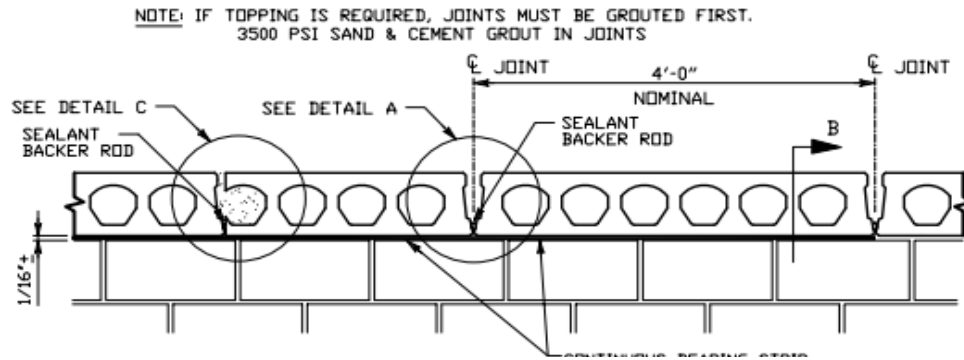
Hollow Core Plank to Plank Connection (image provided by Nitterhouse Concrete Products)
